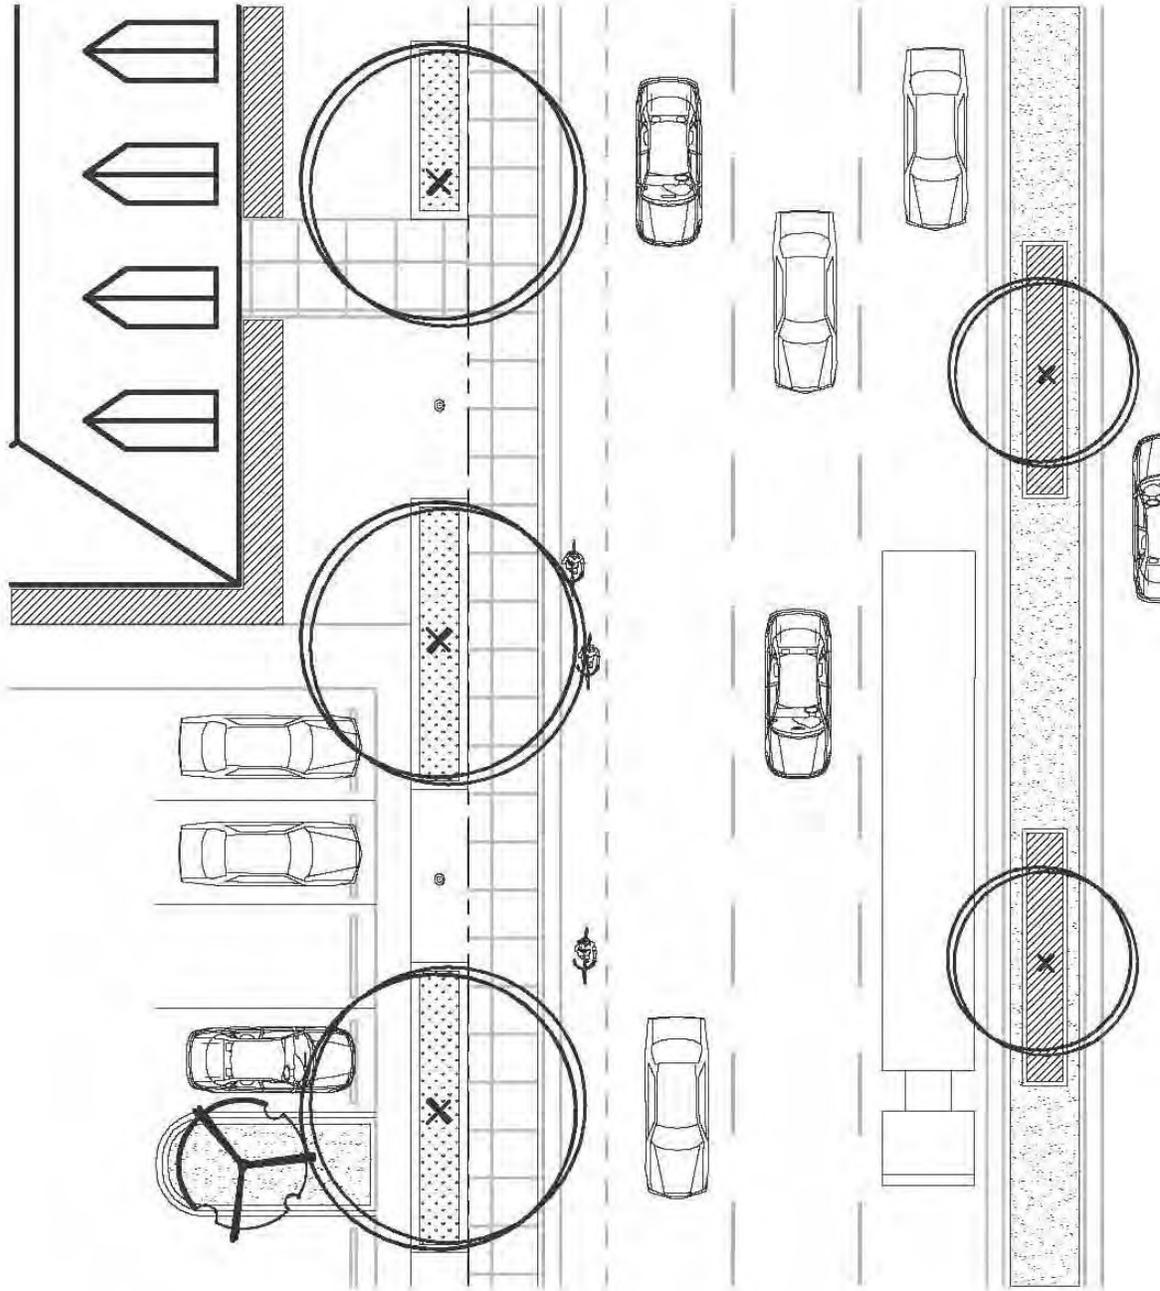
Alternative 1 (Bike Lanes) – Plan View
